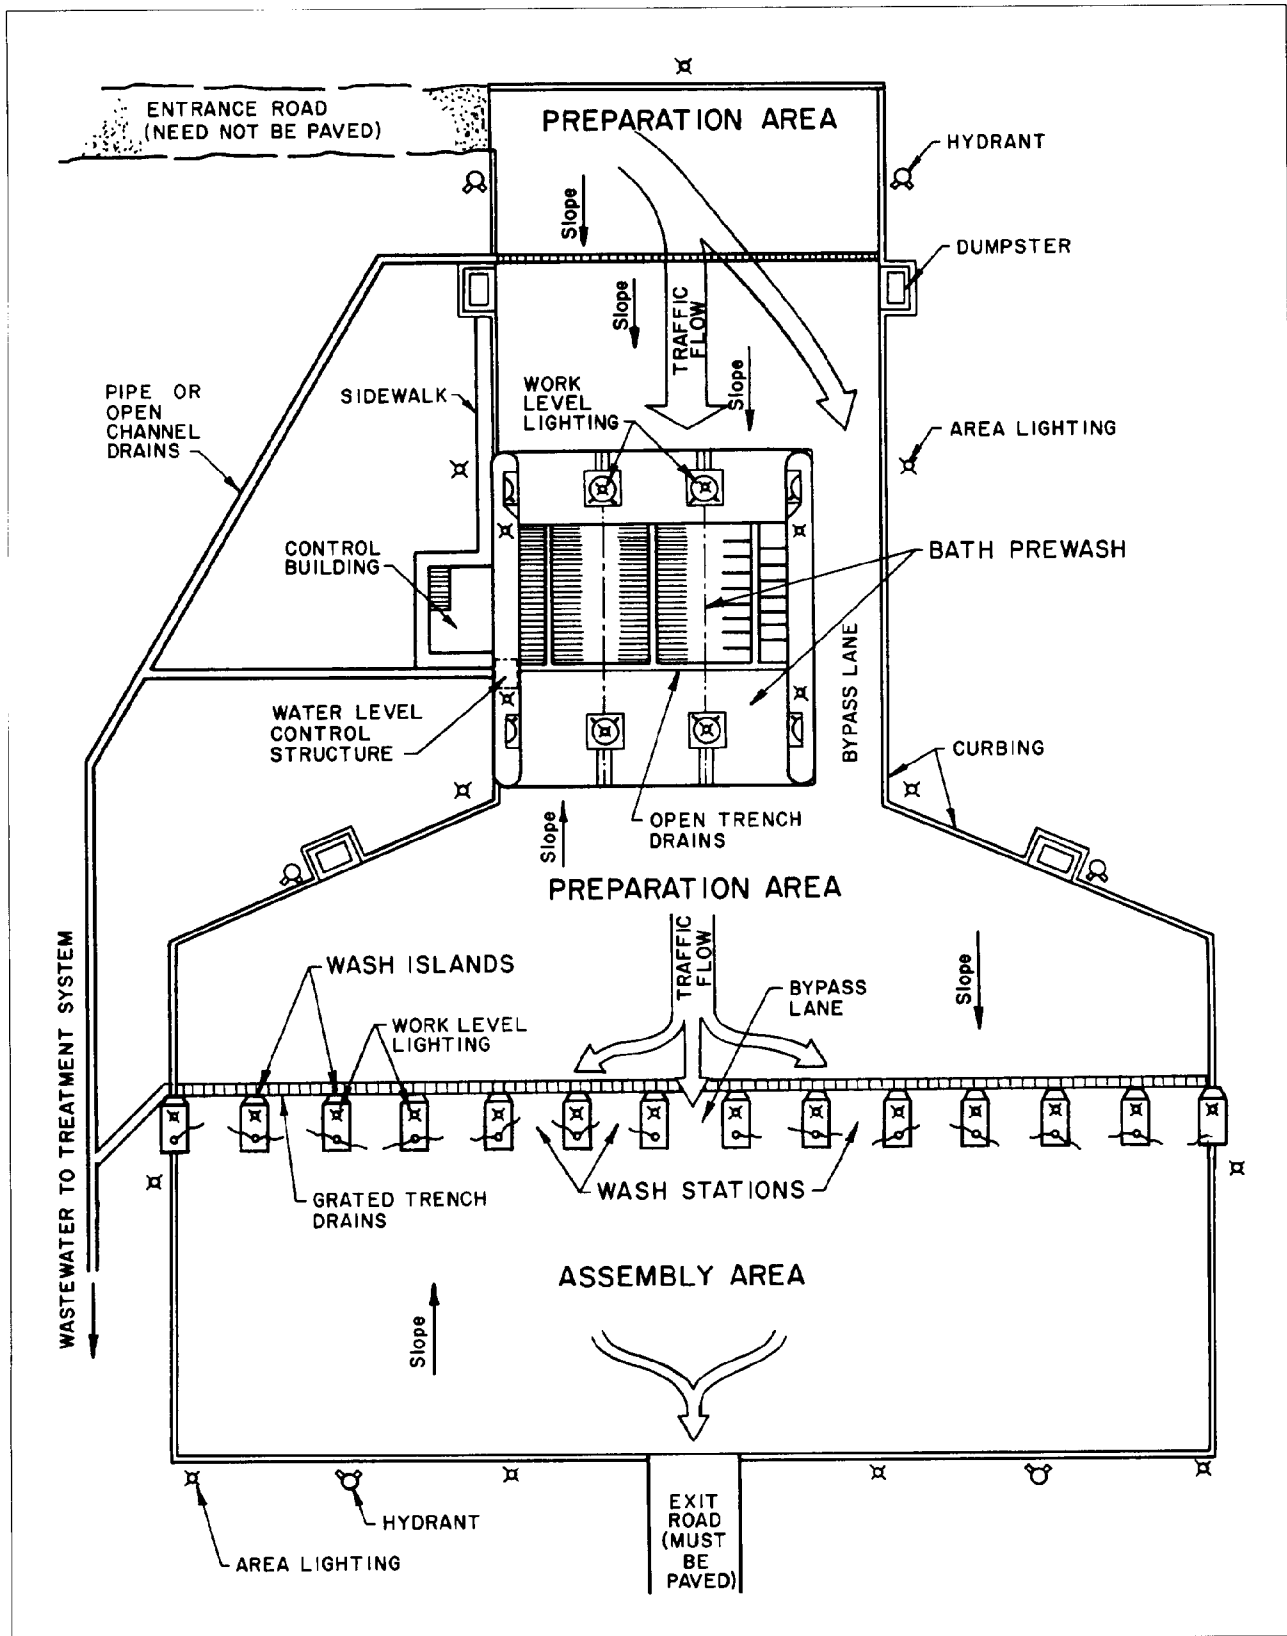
Central vehicle wash facility plan with bath prewash.
